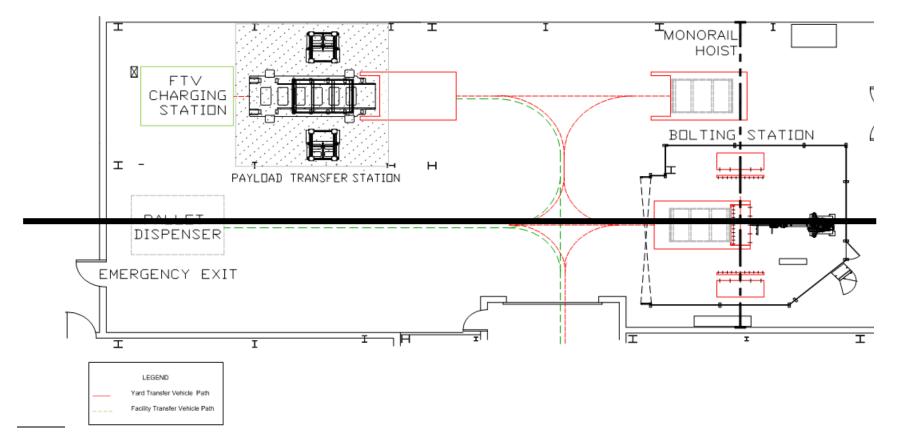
Waste Handling Building Plan (Room 108 Detail)
